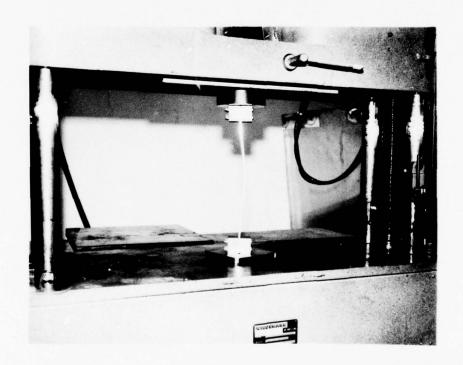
TYPICAL COLUMN TEST SPECIMEN AFTER FAILURE
